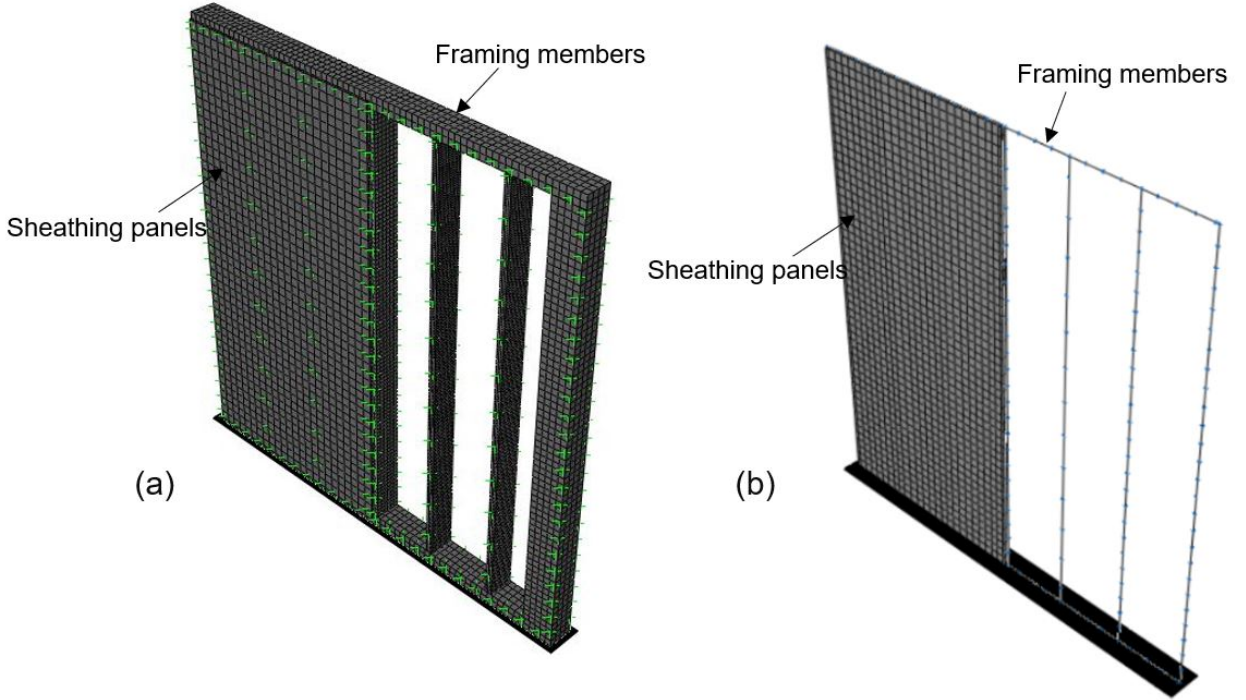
Element types used in the wood light-frame shear wall models:(a) Solid elements model, (b) Beam and shell elements model.
